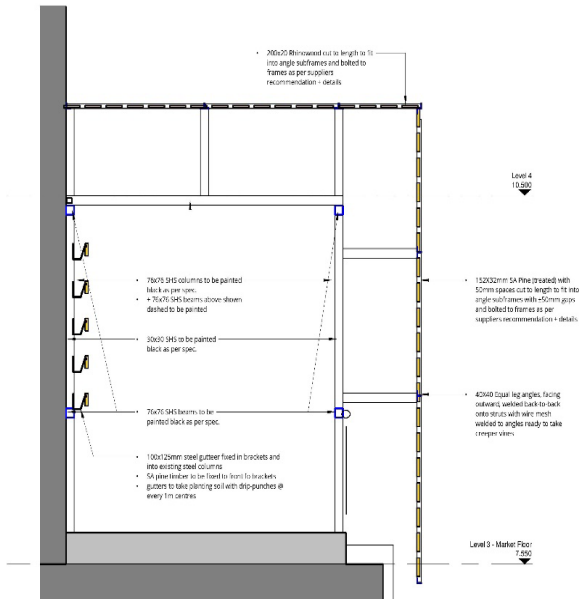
Section through market deck area, indicating five 125 x 100 mm galvanised steel gutters fixed to the steel frame and cladded with 38 x 152 mm SA pine timber slats, bolted onto the frame
